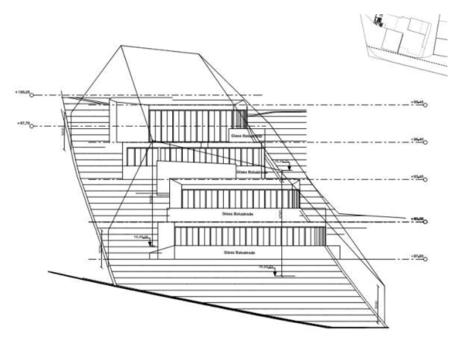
eastern elevation of the proposed dwellings at 18 Ascot Avenue.
